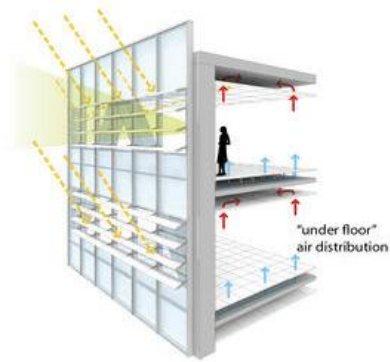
East and West Curtain Wall Shading strategy (www.panoramio.com)
